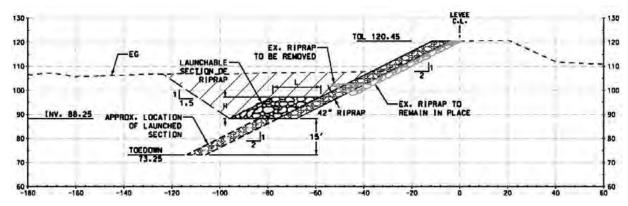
Typical Cross Section of Alternative D1 (Sta. 368+00)
